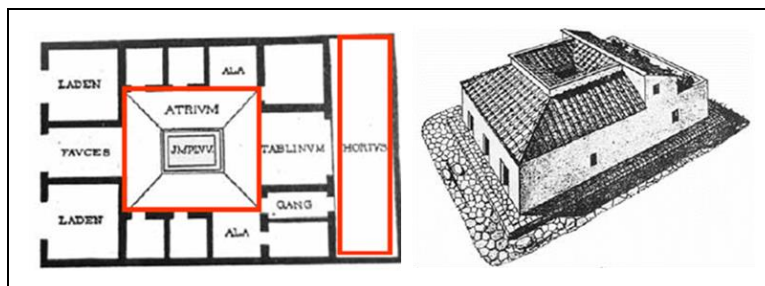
Plan (left) and 3D view (right) of traditional Roman house.
